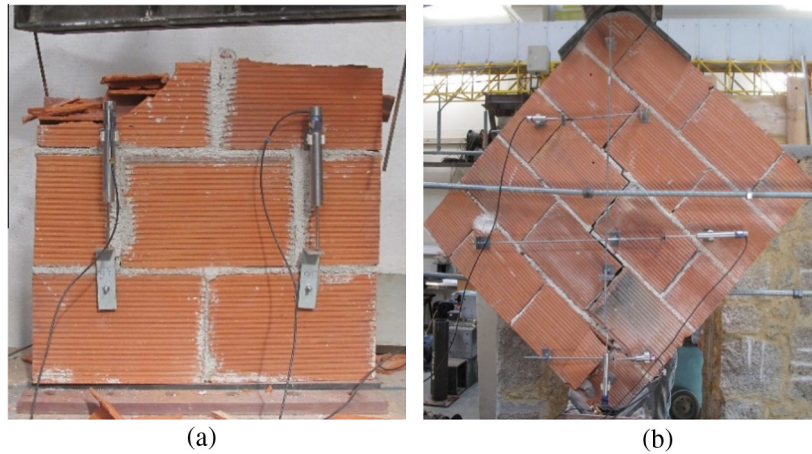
Masonry wallet damage after: (a) vertical compressive strength test and (b) diagonal tensile strength test.
